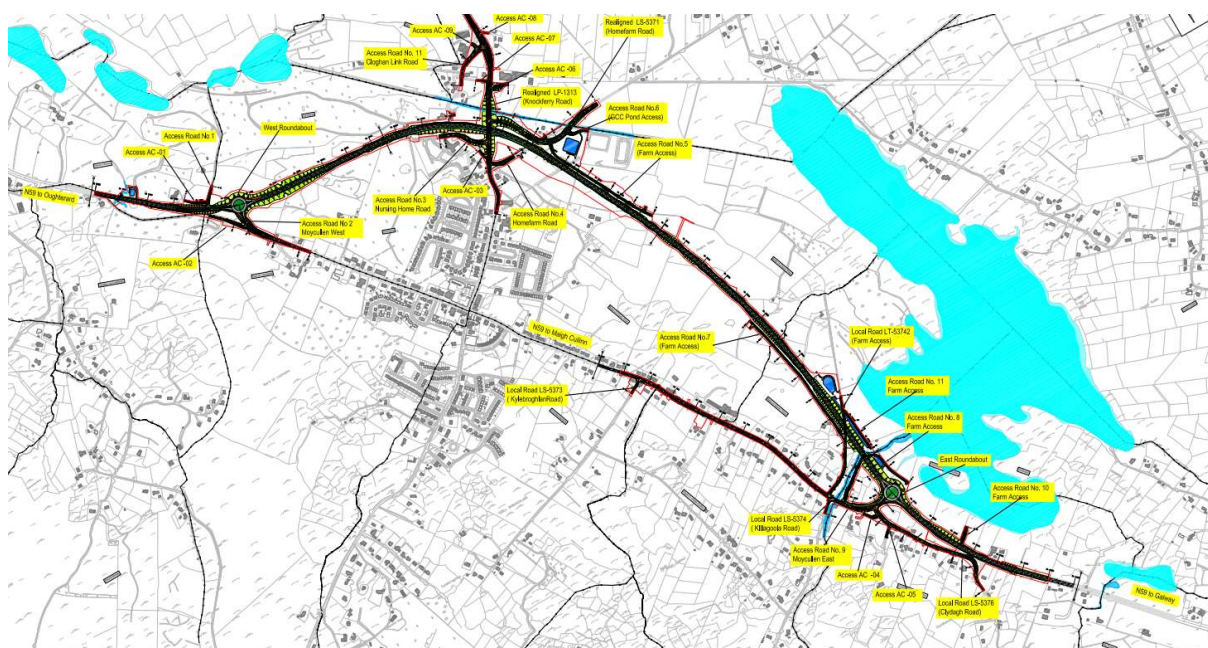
Indicative Layout Maigh Cuilinn Bypass
